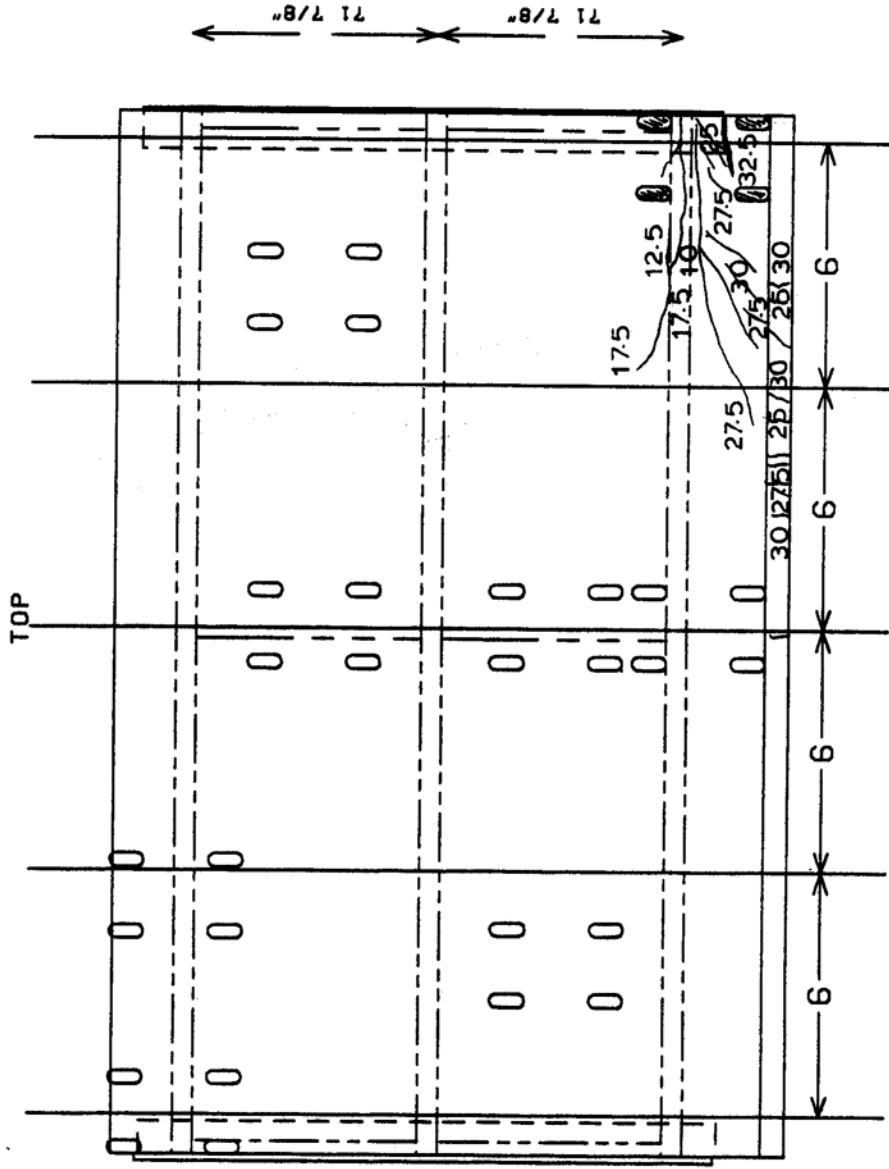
Top Cracking Pattern (Third Bridge - Test No. 4)
